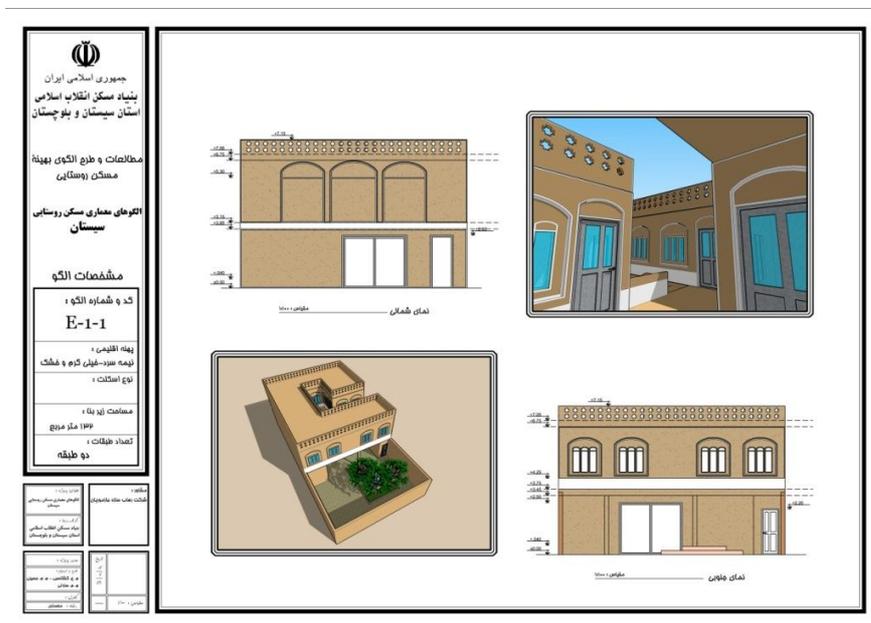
proposed pattern (1) (three- dimensional design, plan and facades)
